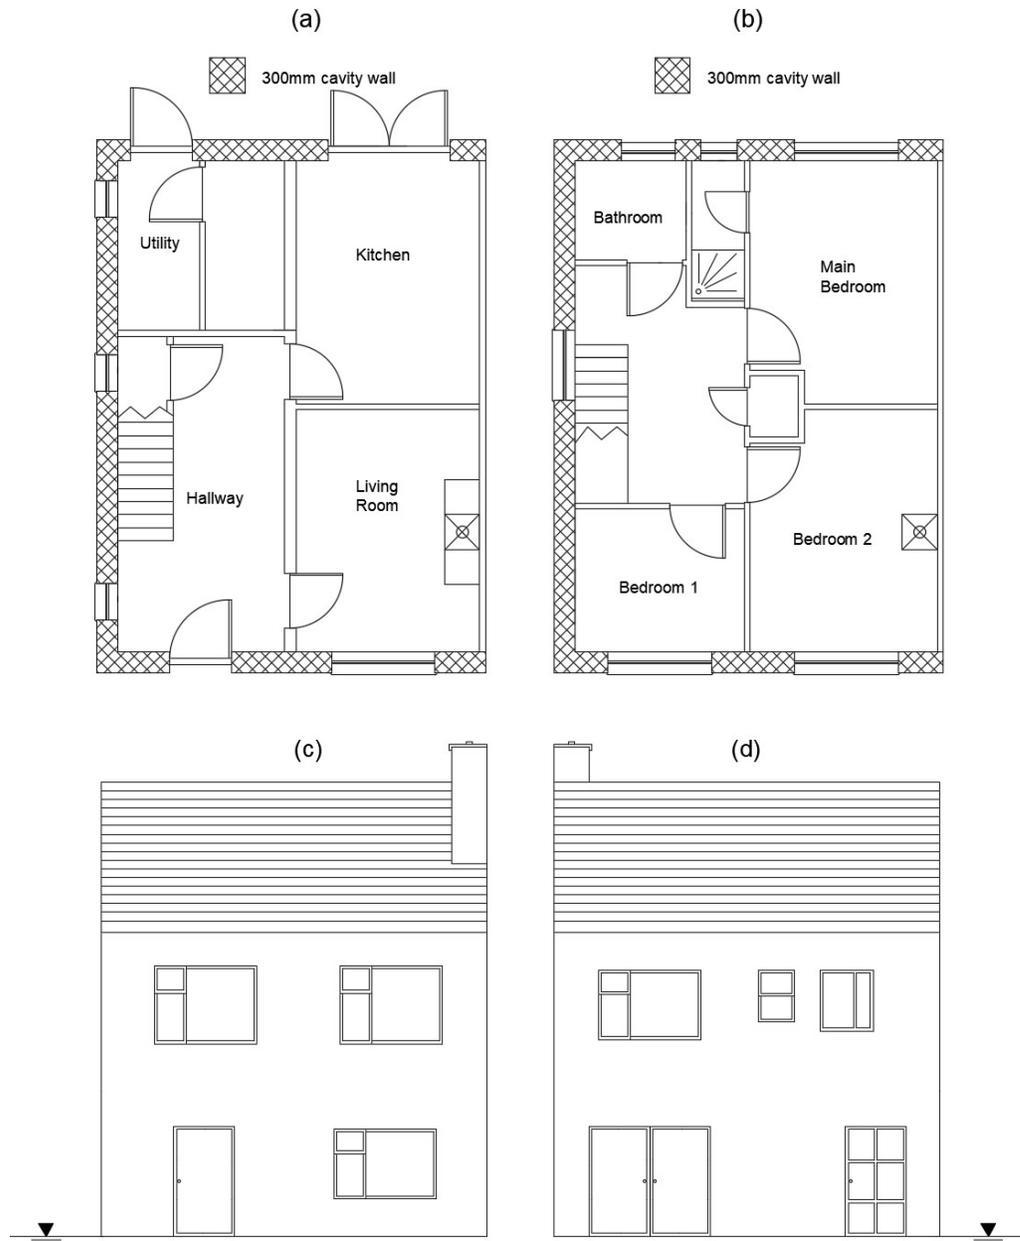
(a) Ground floor layout, (b) First floor layout, (c) Front façade and (d) Back façade of theoretical case study semi-detached house.
